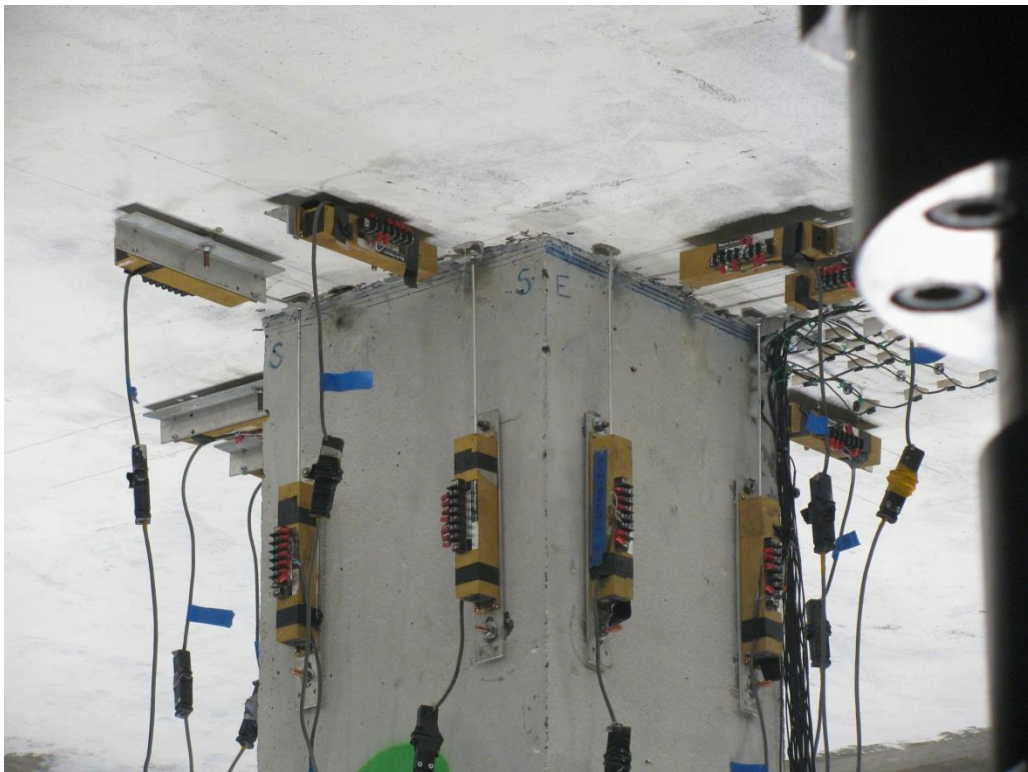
Specimen B2 – Bottom Surface of Slab-Column Connection Prior to Testing
